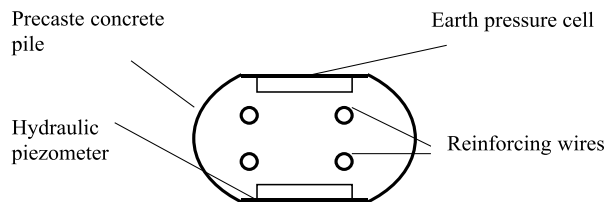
Instrumented cross-sections of a precast concrete pile (Gregersen et al. [8])
